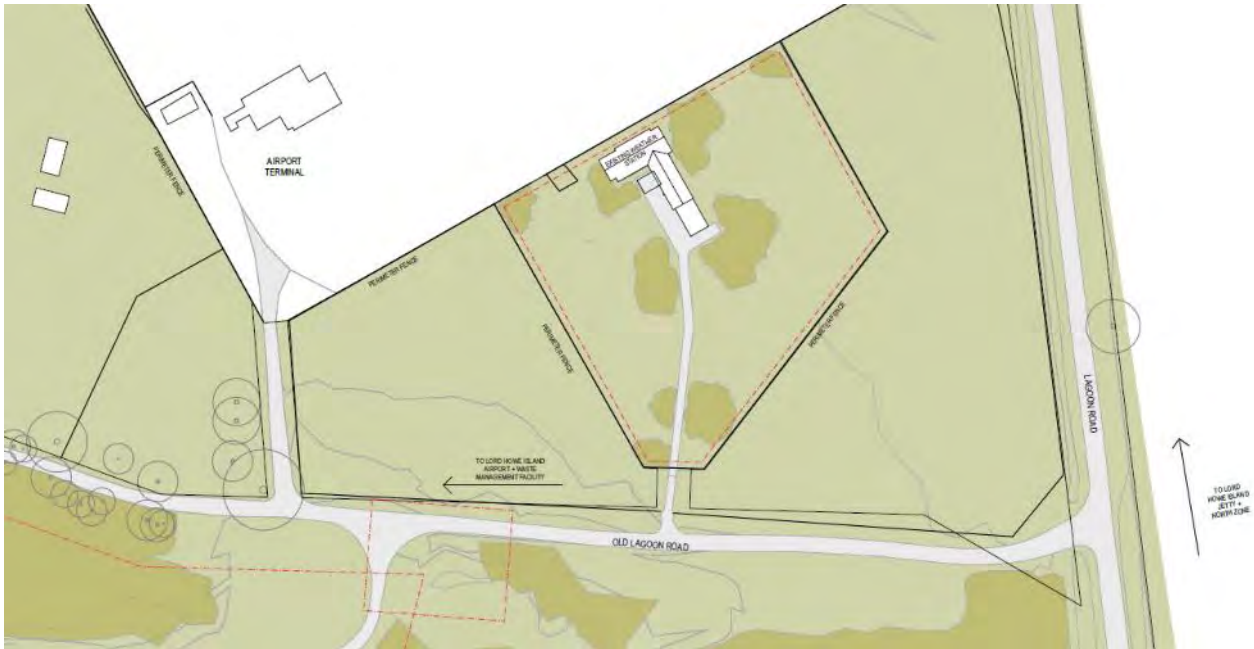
SOUTH ZONE: PROPOSED SITE PLAN – WMF, DRAWING A-DA-11.14 REV 04, 06/08/2025 (LAHZNIMMO ARCHITECTS)
